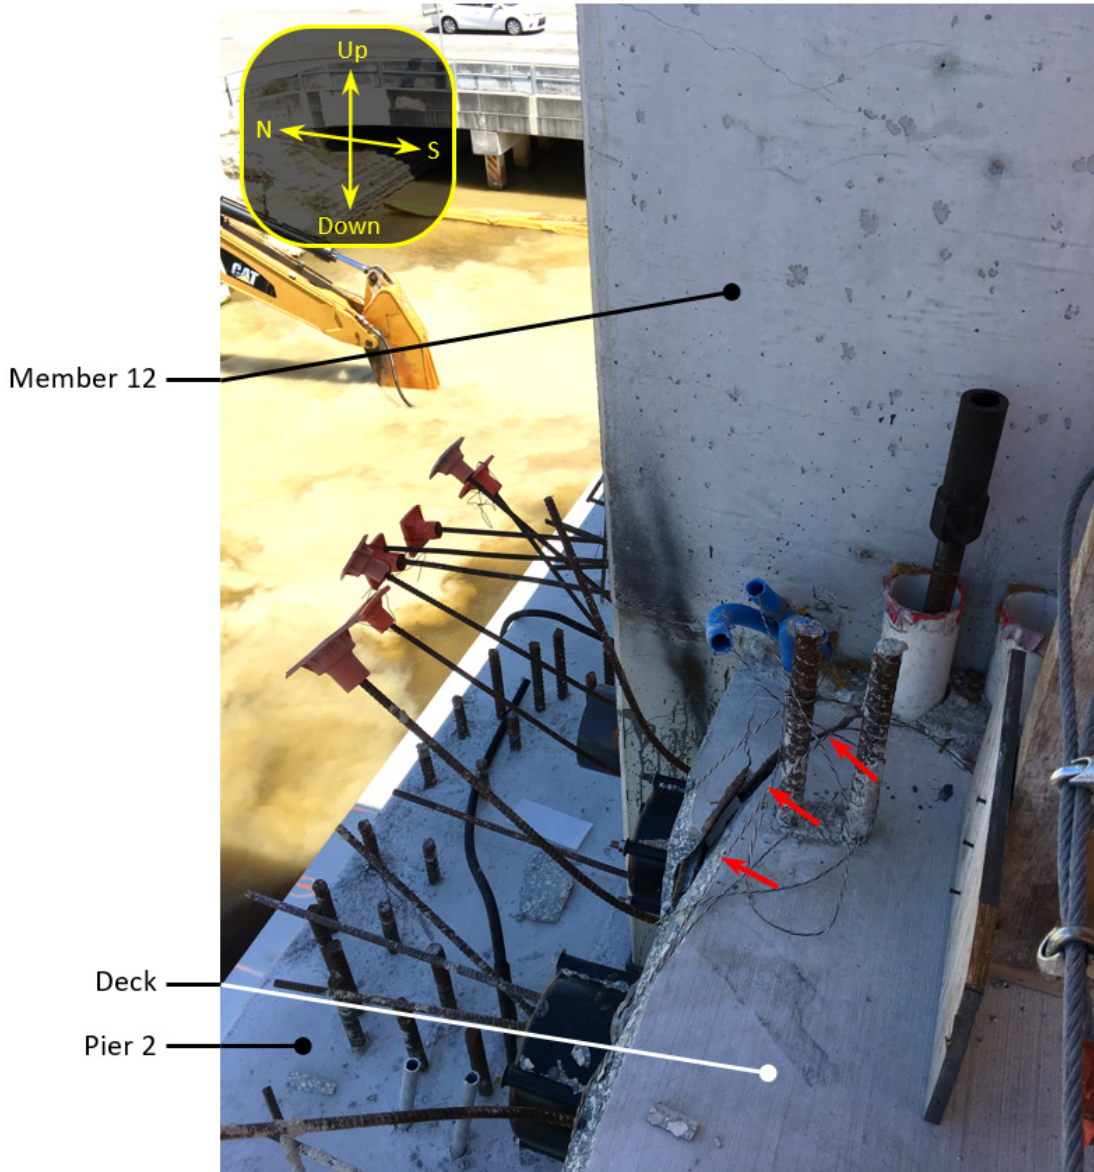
Photograph showing the west face of truss member 12 where it meets the deck on March 14, 2018 at 1:51 p.m. Corresponds to Bridge Factors Factual Report Photo 98.
